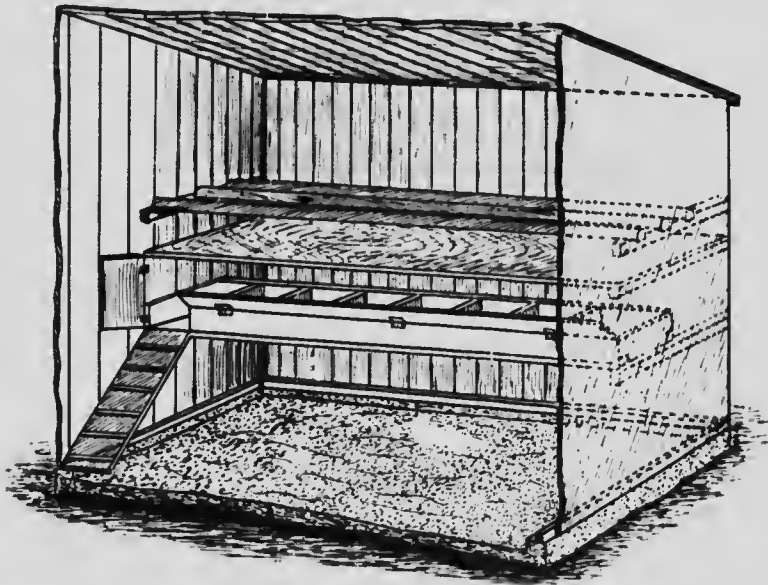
Showing construction of dropping board and nests, which are so arranged to be convenient for collecting the eggs and are also raised off the floor, giving all the floor space for scratching purposes.
